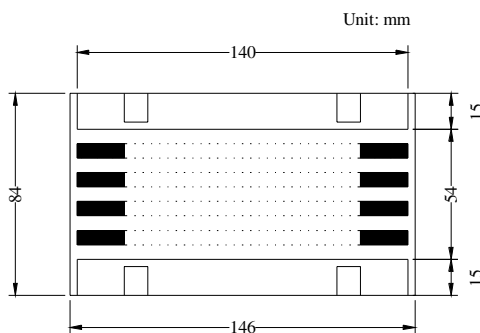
Schematic of Stirrup Rubber Bearing (SRB)
